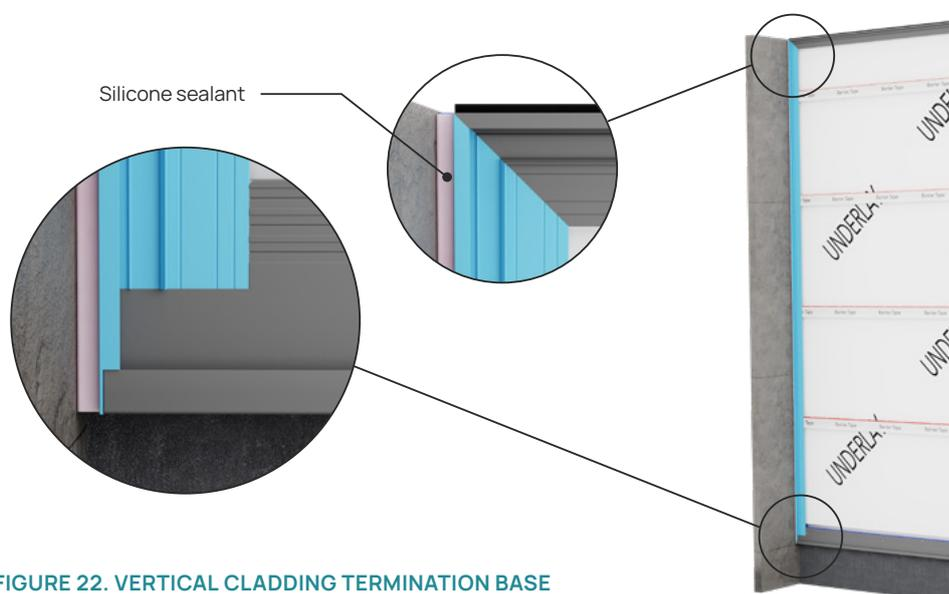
VERTICAL CLADDING TERMINATION BASE FLASHING INSTALLATION
